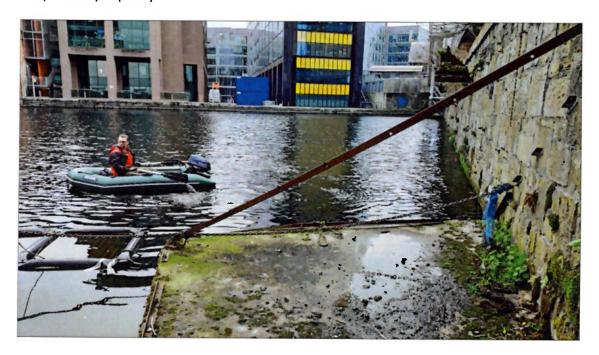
The concrete platform at the existing Grand Canal Tunnel discharge outfall could be retained after proposed upgrade works given its use as a regular sprainting site and suitability as an artificial holt site. Note remnants of floating vegetation islands/mats in left foreground.
